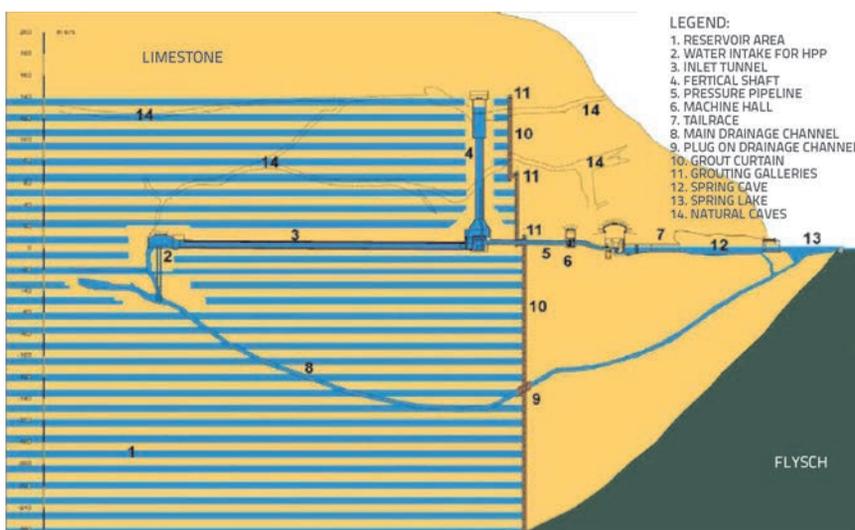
Ombla HPP – longitudinal profile through inlet tunnel and machine hall
